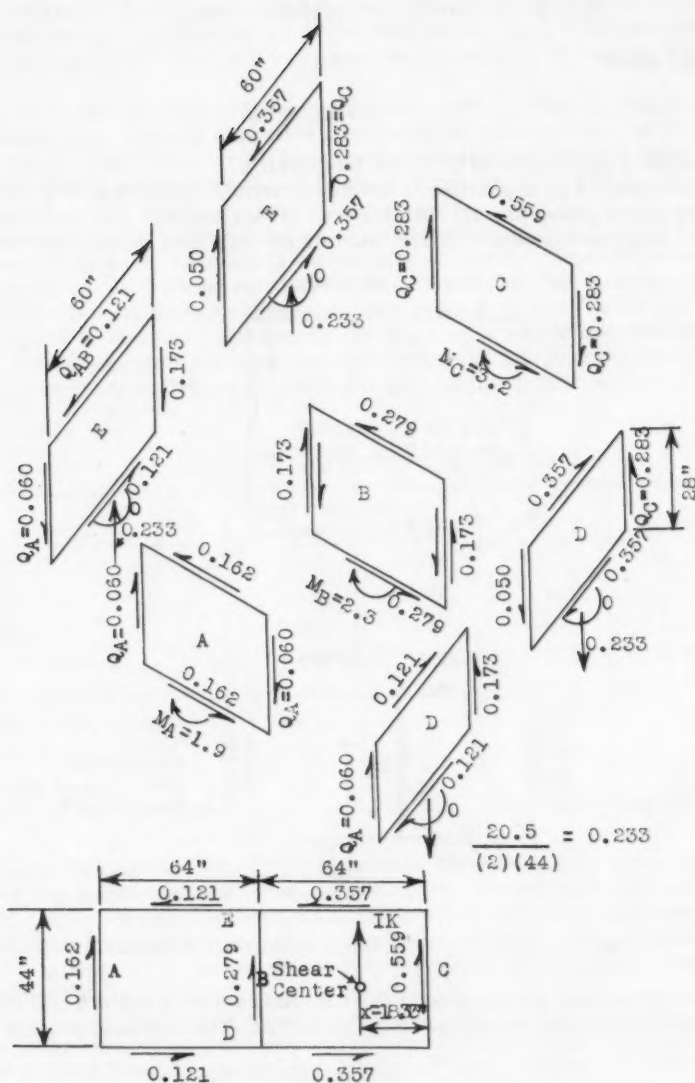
ASSEMBLY COMPONENTS. SHEAR WALLS A, B, AND C, AND FACE WALLS D AND E, SPECIMEN SD-7.
